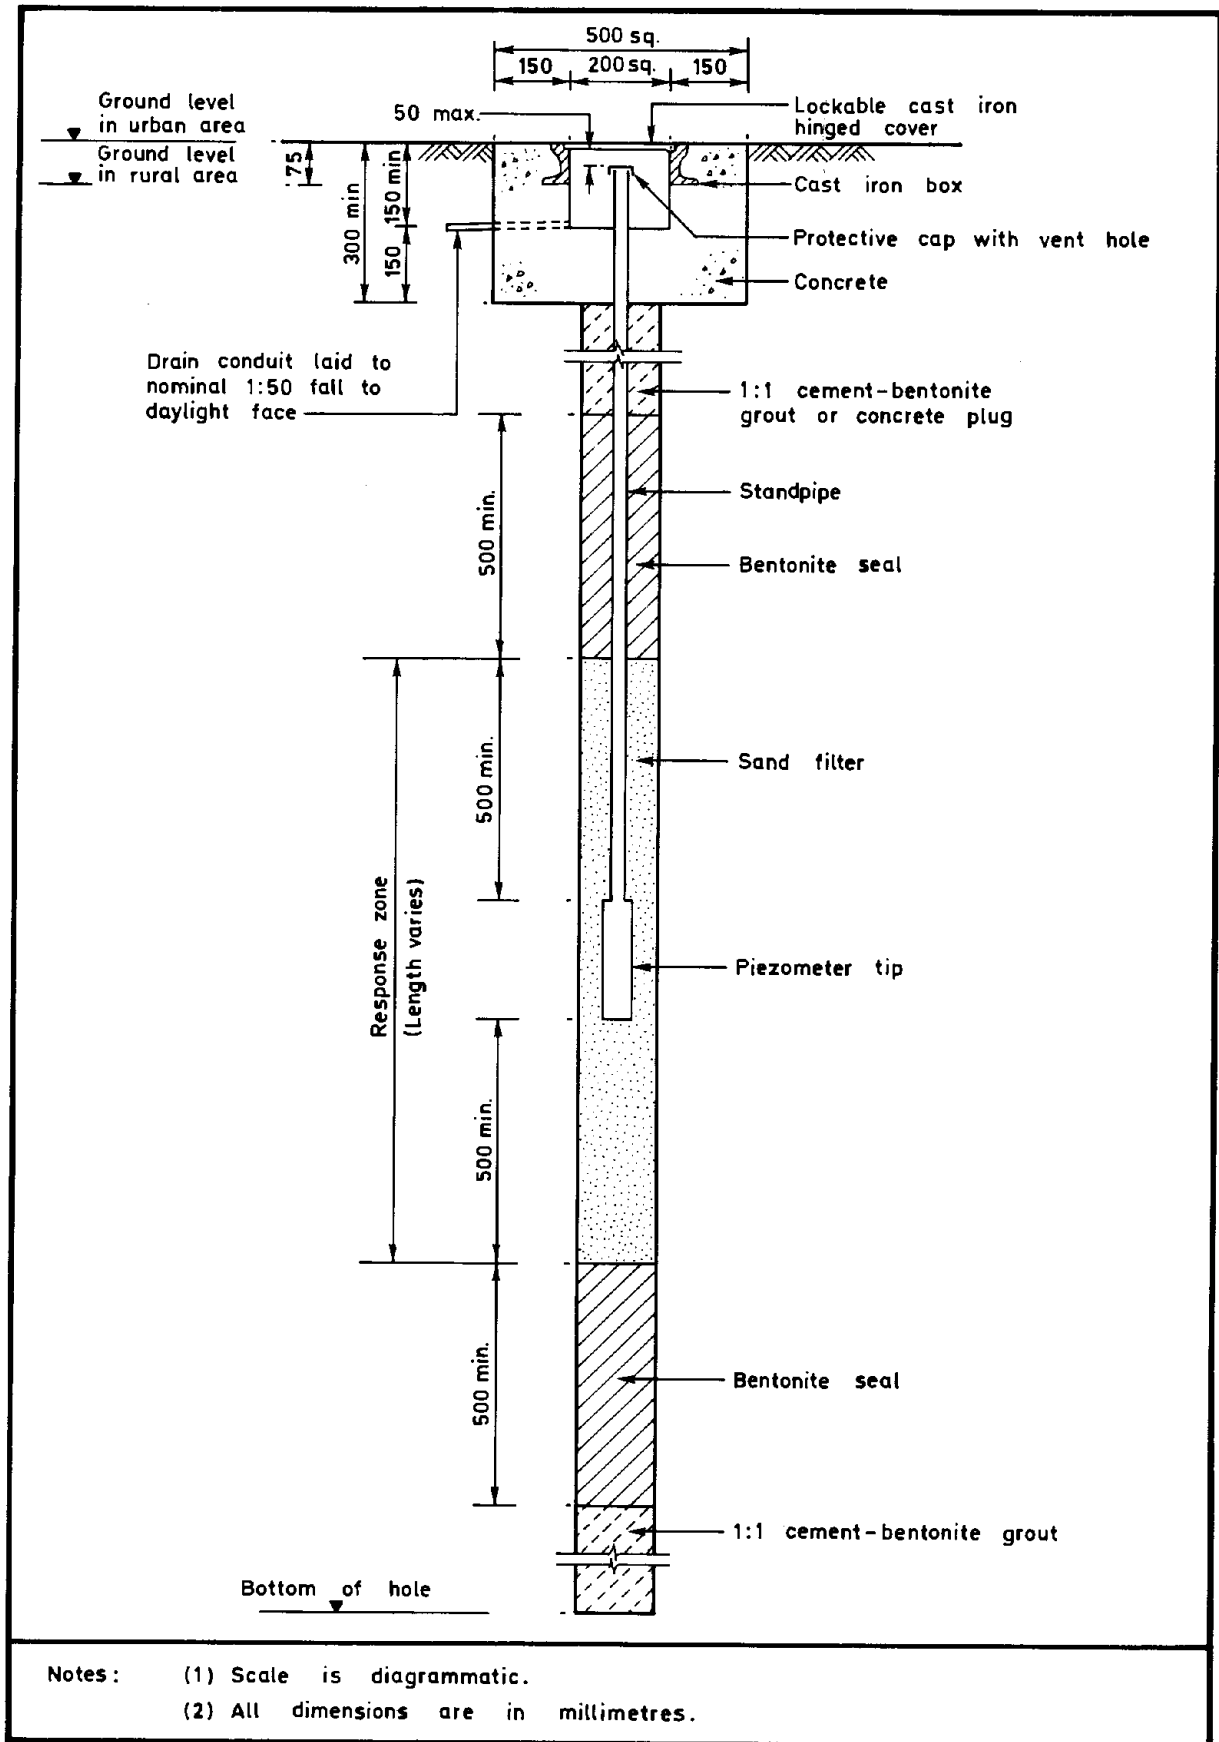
Typical Installation Details of a Piezometer in a Borehole
